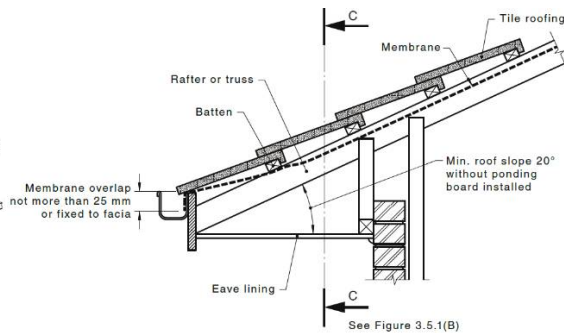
(C) HIGH PITCHED TILED ROOF (NO ANTI-PONDING BOARD)—MEMBRANE INSTALLED UNDER BATTENS
